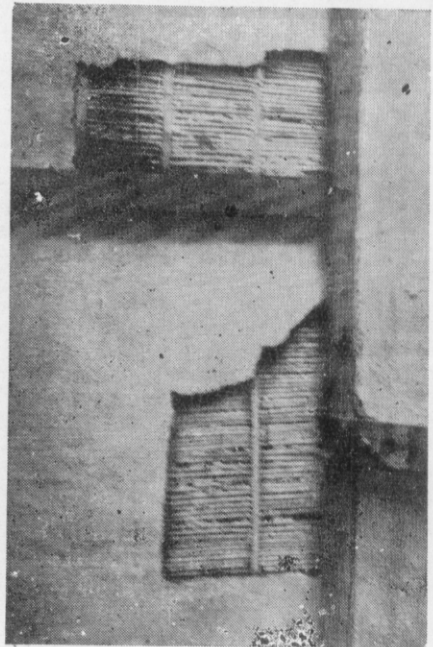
Ekra Construction of Assam, India wooden frames filled with Ekra, plastered with mortar, An earthquake resistant construction.
